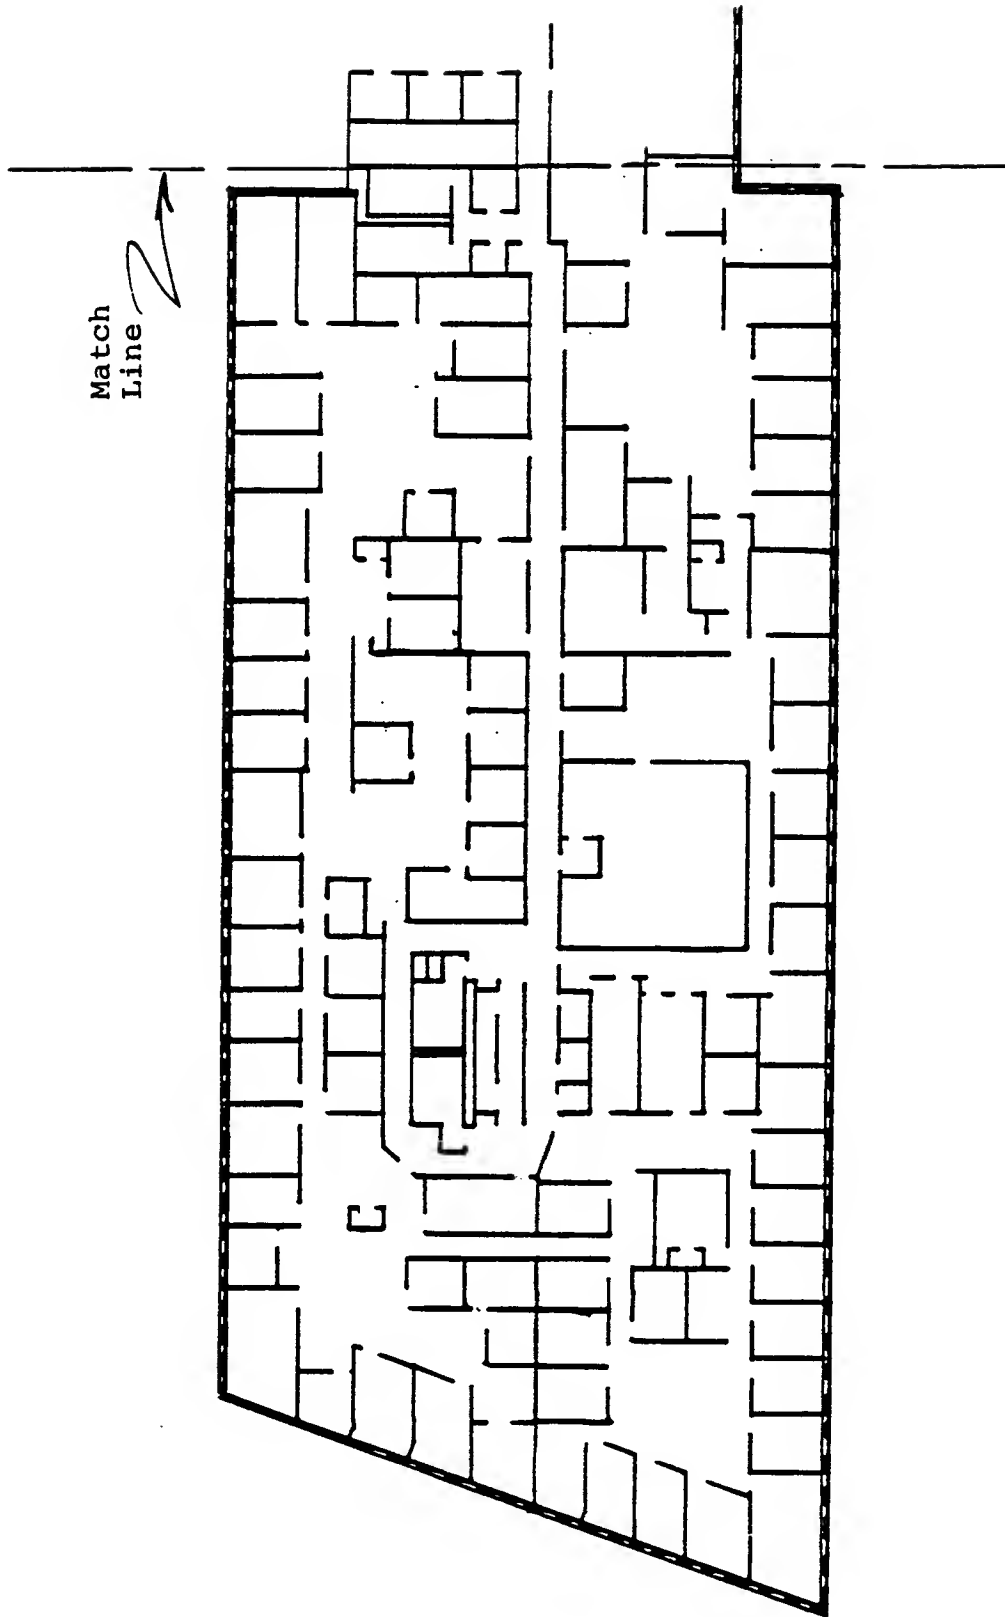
USIA BUILDING SEVENTH FLOOR-SOUTH
